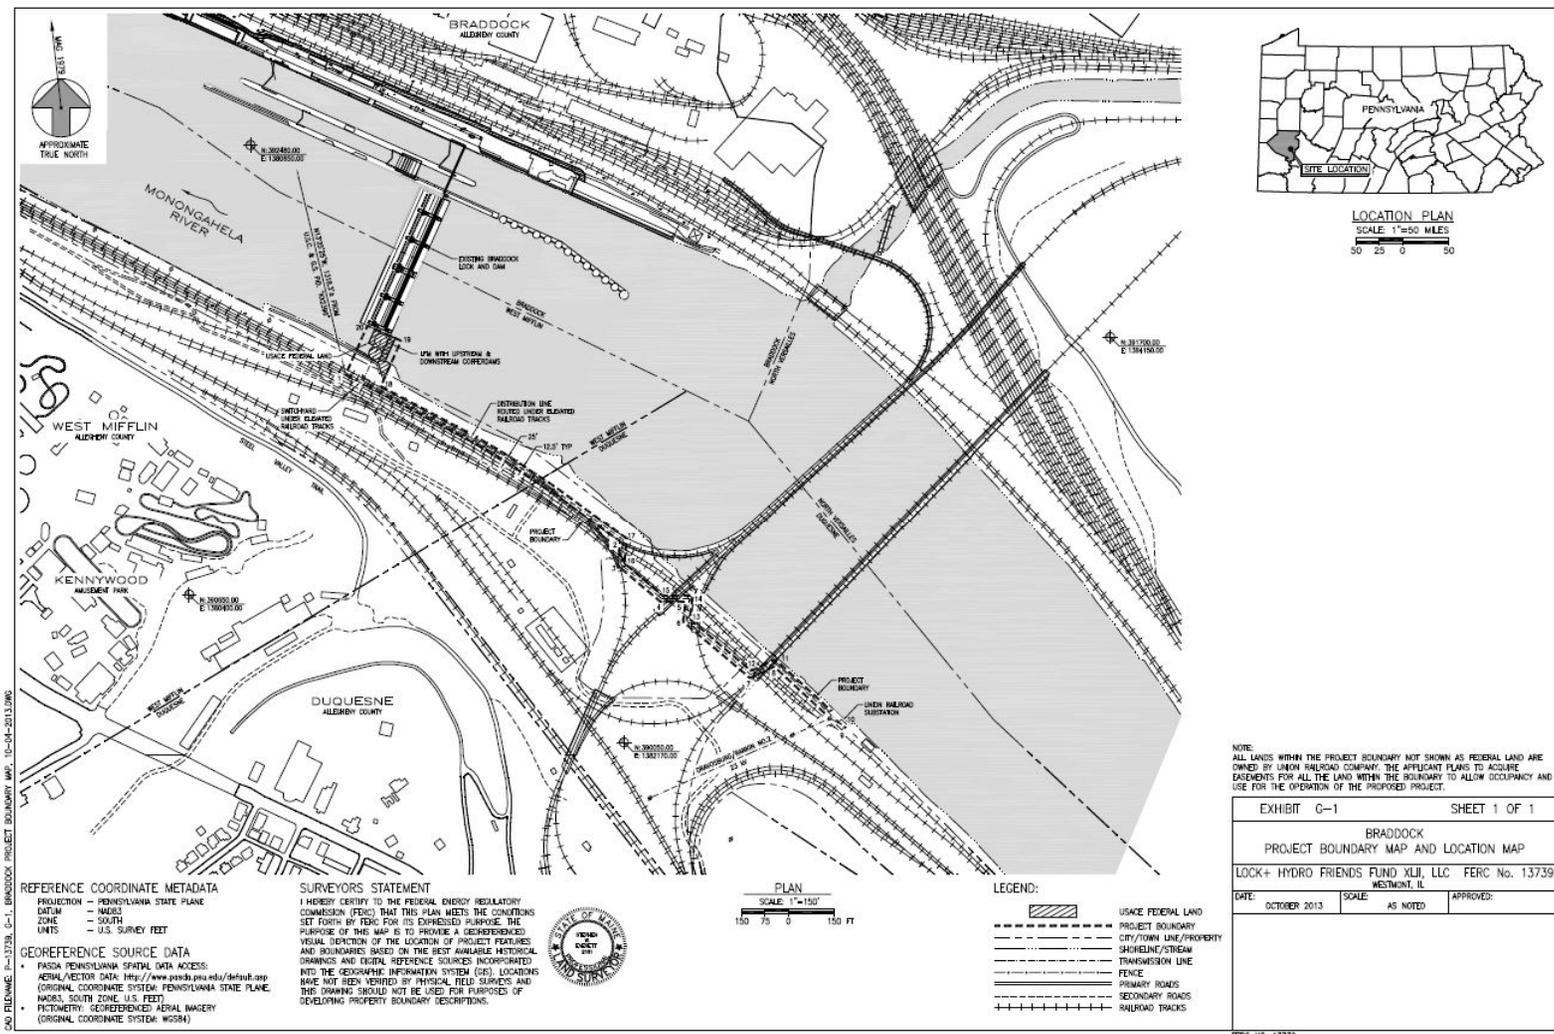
Project facilities for the Braddock Locks and Dam Hydroelectric Project, P-13739 (Source: Hydro Friends)
